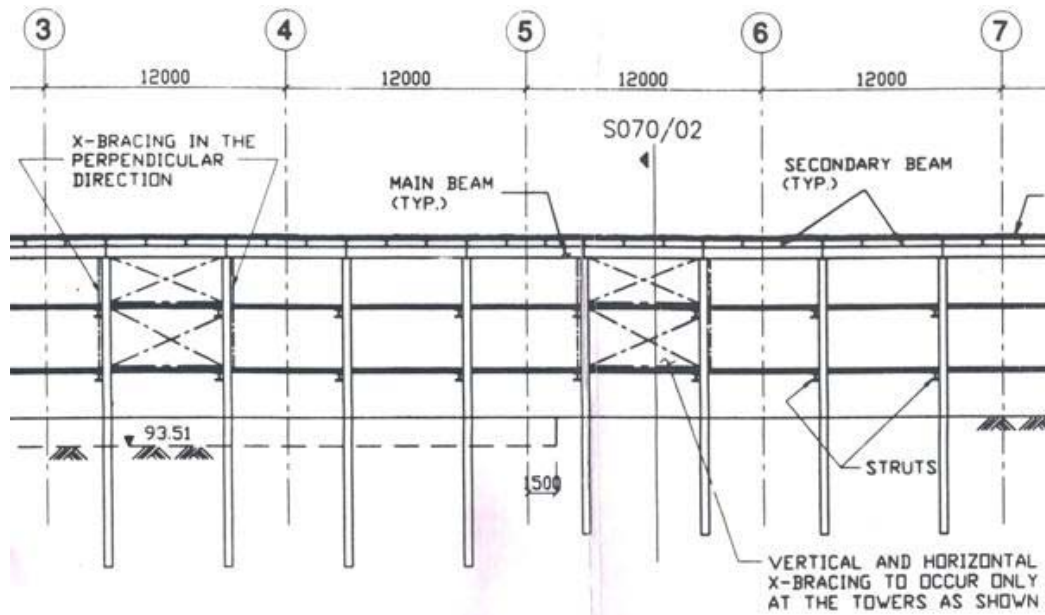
Longitudinal section showing towers to collect and transmit strut/KP restraint forces to walls.
